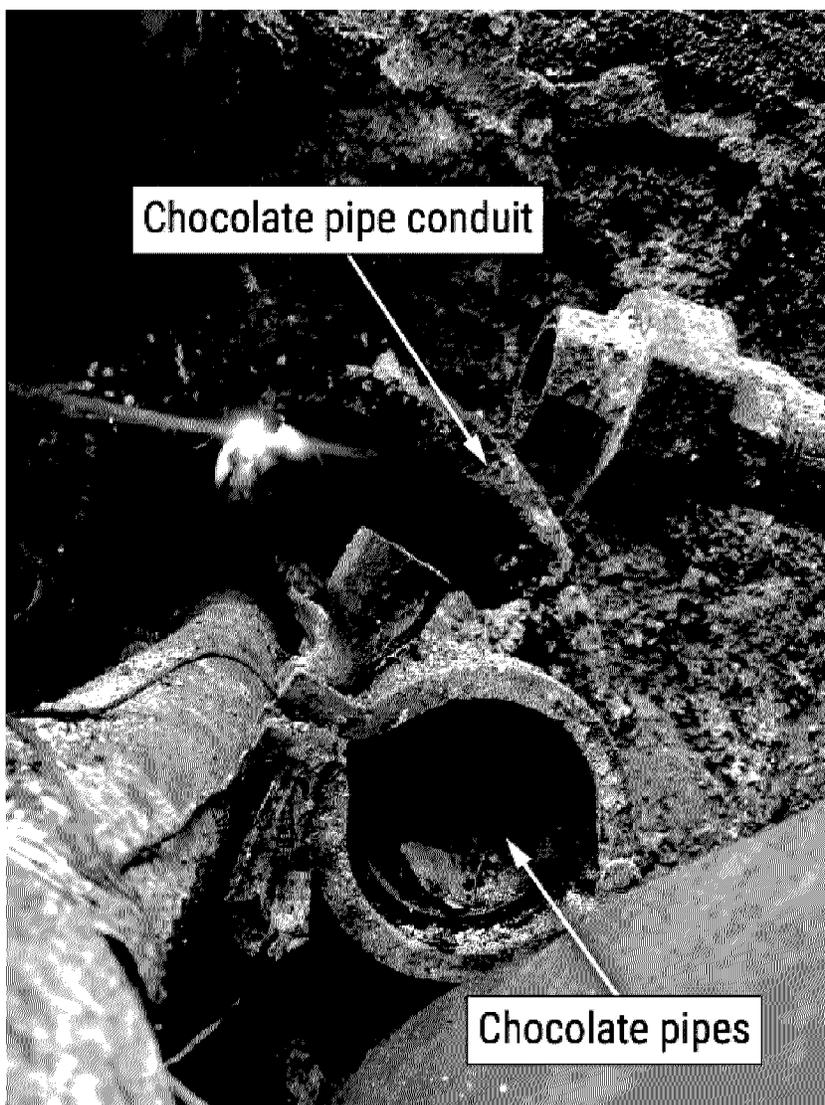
A view of one of the chocolate pipe conduits from the Building 2 basement.
